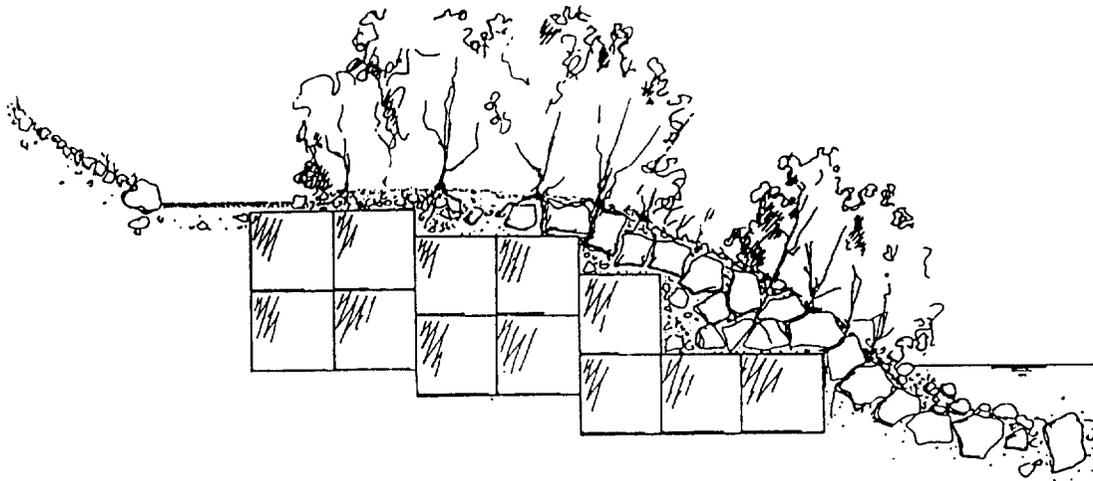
Shore protection at Reuss river close to Gotthard highway tunnel, with concrete groins of 66 t weight.
